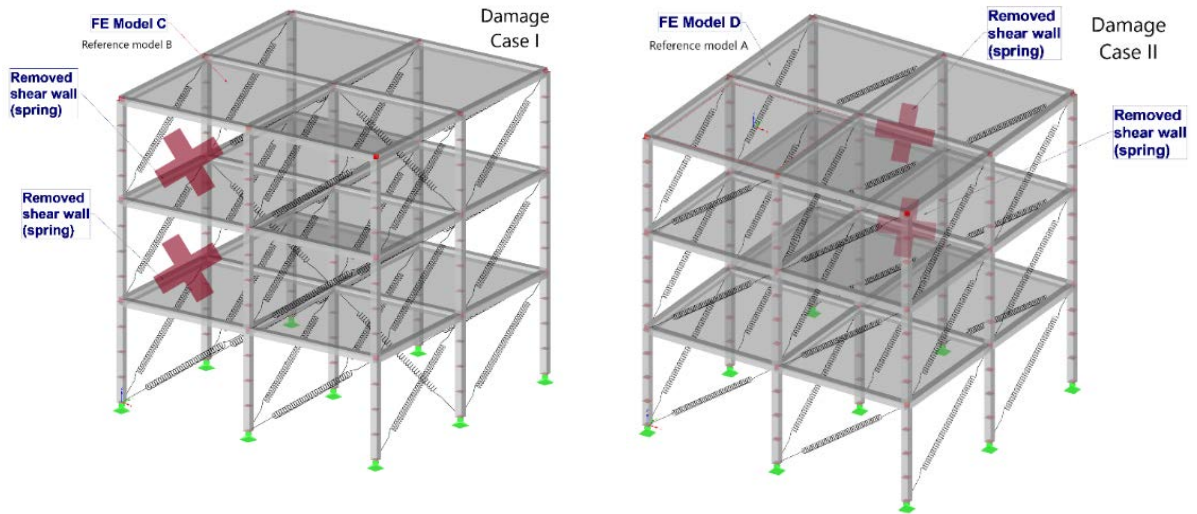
FE Models of buildings for damaged state (highlighted only introduced structural differences due to damage).
